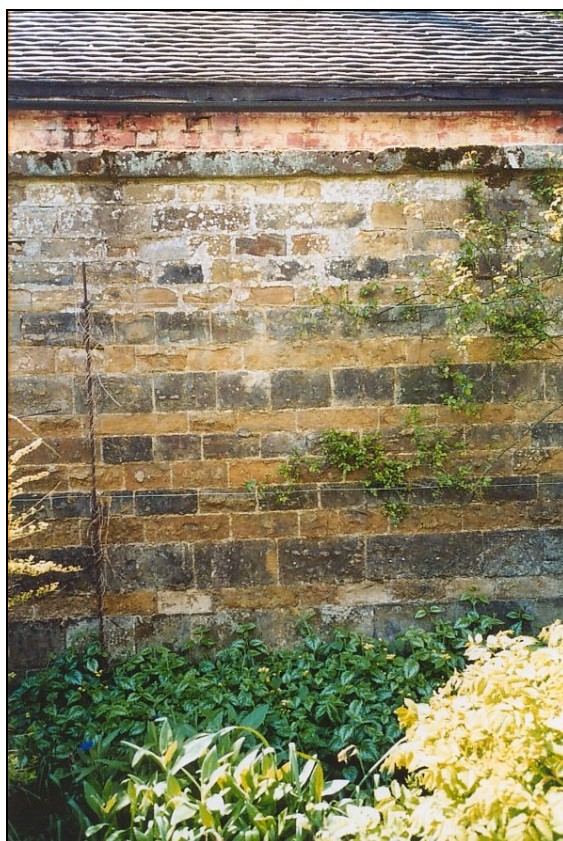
Detail of polychrome banded stone wall in garden at base of the SE gable wall.
